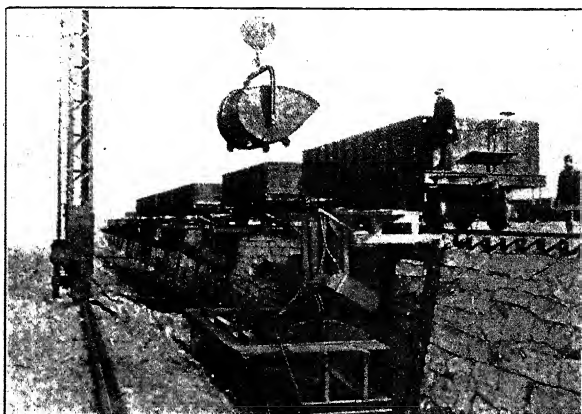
STOCKING-TRACK, ROAN JUNCTION, PA.
